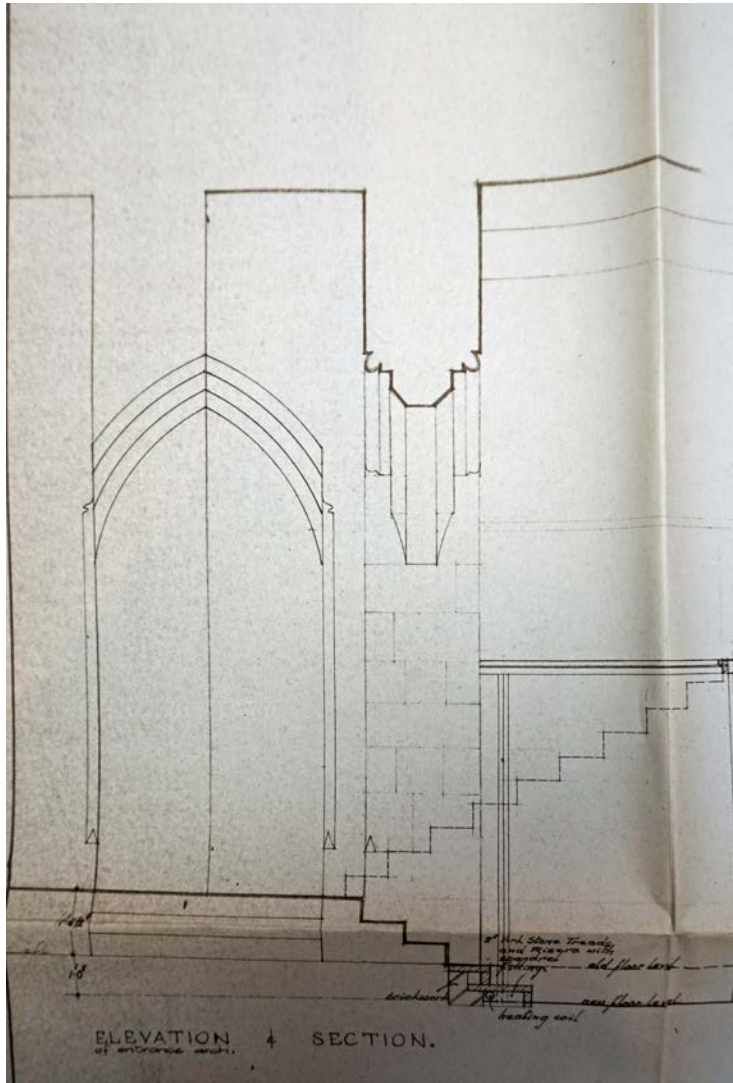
1957 section showing the lowered floor in the Annex, the extension of the staircase and the pointed arch opening on the south wall of the Annex, which led into a corridor to the main range of the Library, Fielding, Dodd and Stevens (Exeter College Archive)
